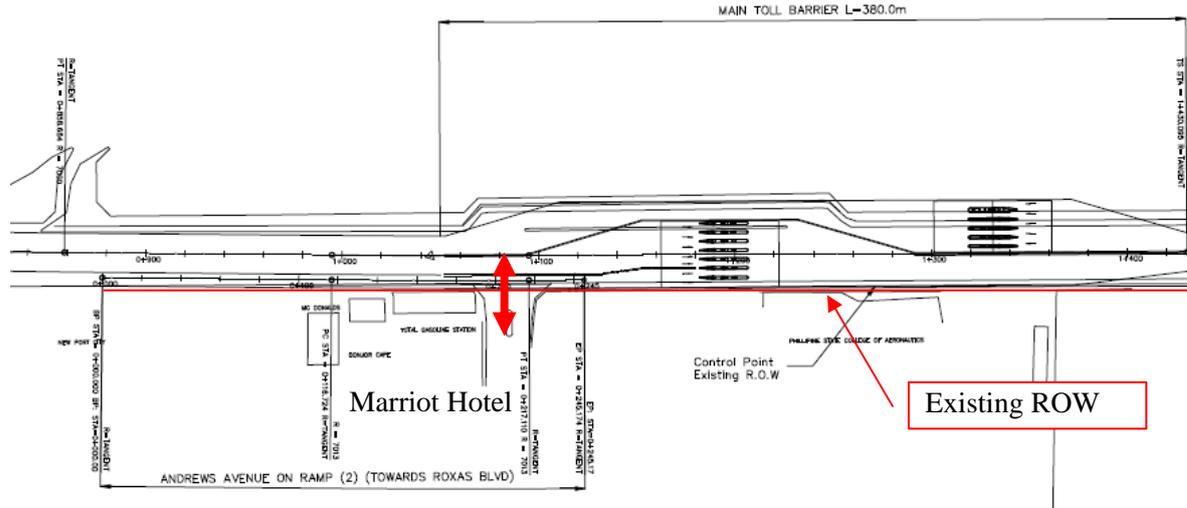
ANDREWS AVENUE ON RAMP (2)
